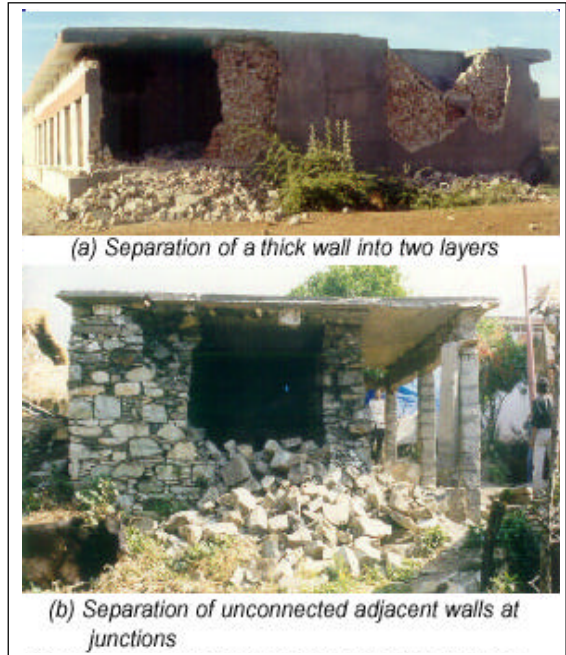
Major concerns in a traditional stone house – deficiencies in walls, roof and in their connections have been prime causes for failure.
